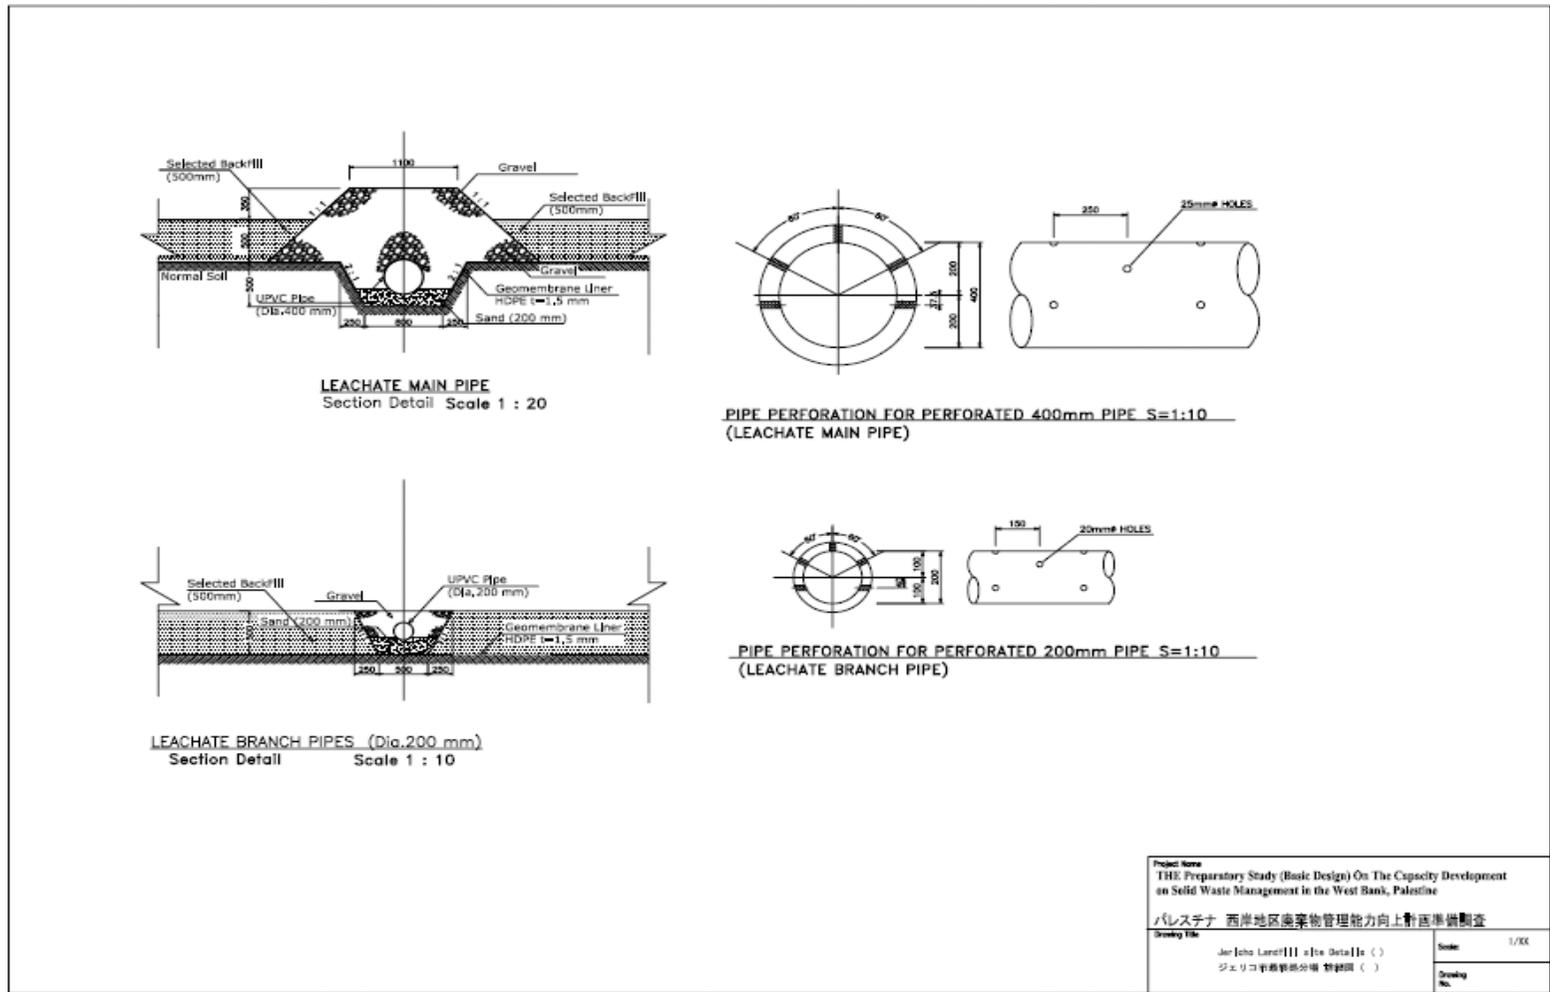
Details of Final Landfill Facilities (2/2) (Jericho JC)
